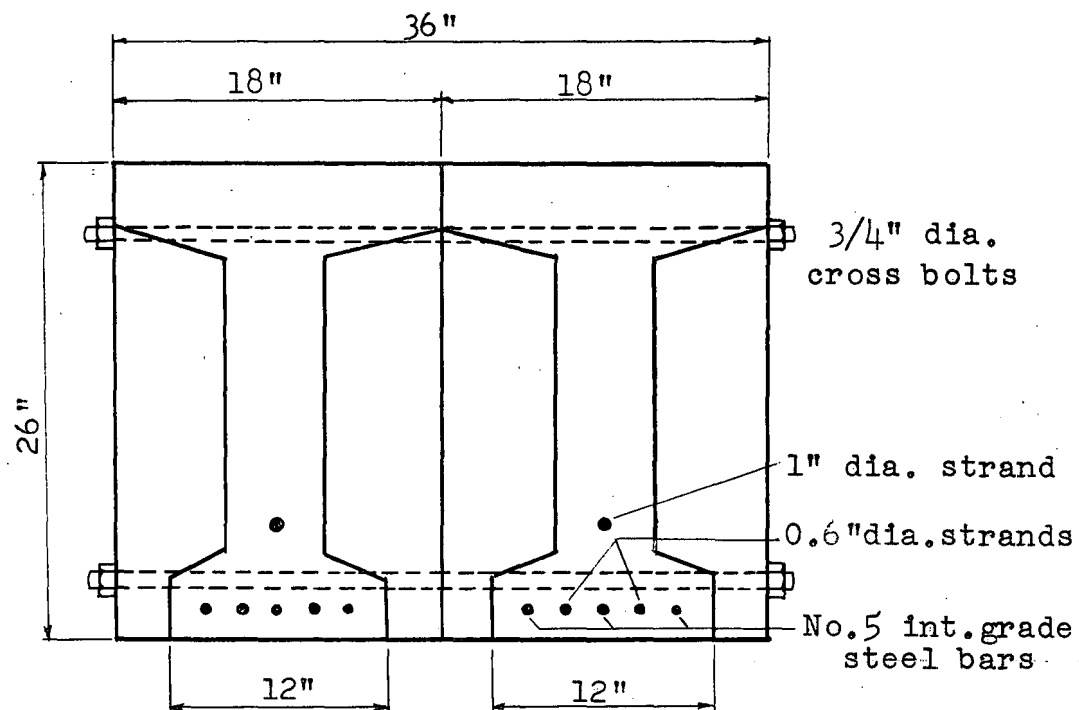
CROSS SECTION OF 38-FT. SPAN POST-TENSIONED MEMBER
